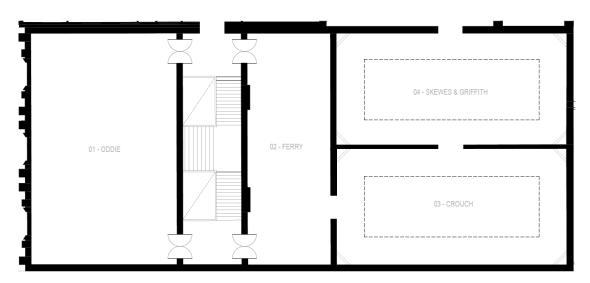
Existing first floor plan of Fine Art Gallery building Source: Lovell Chen
